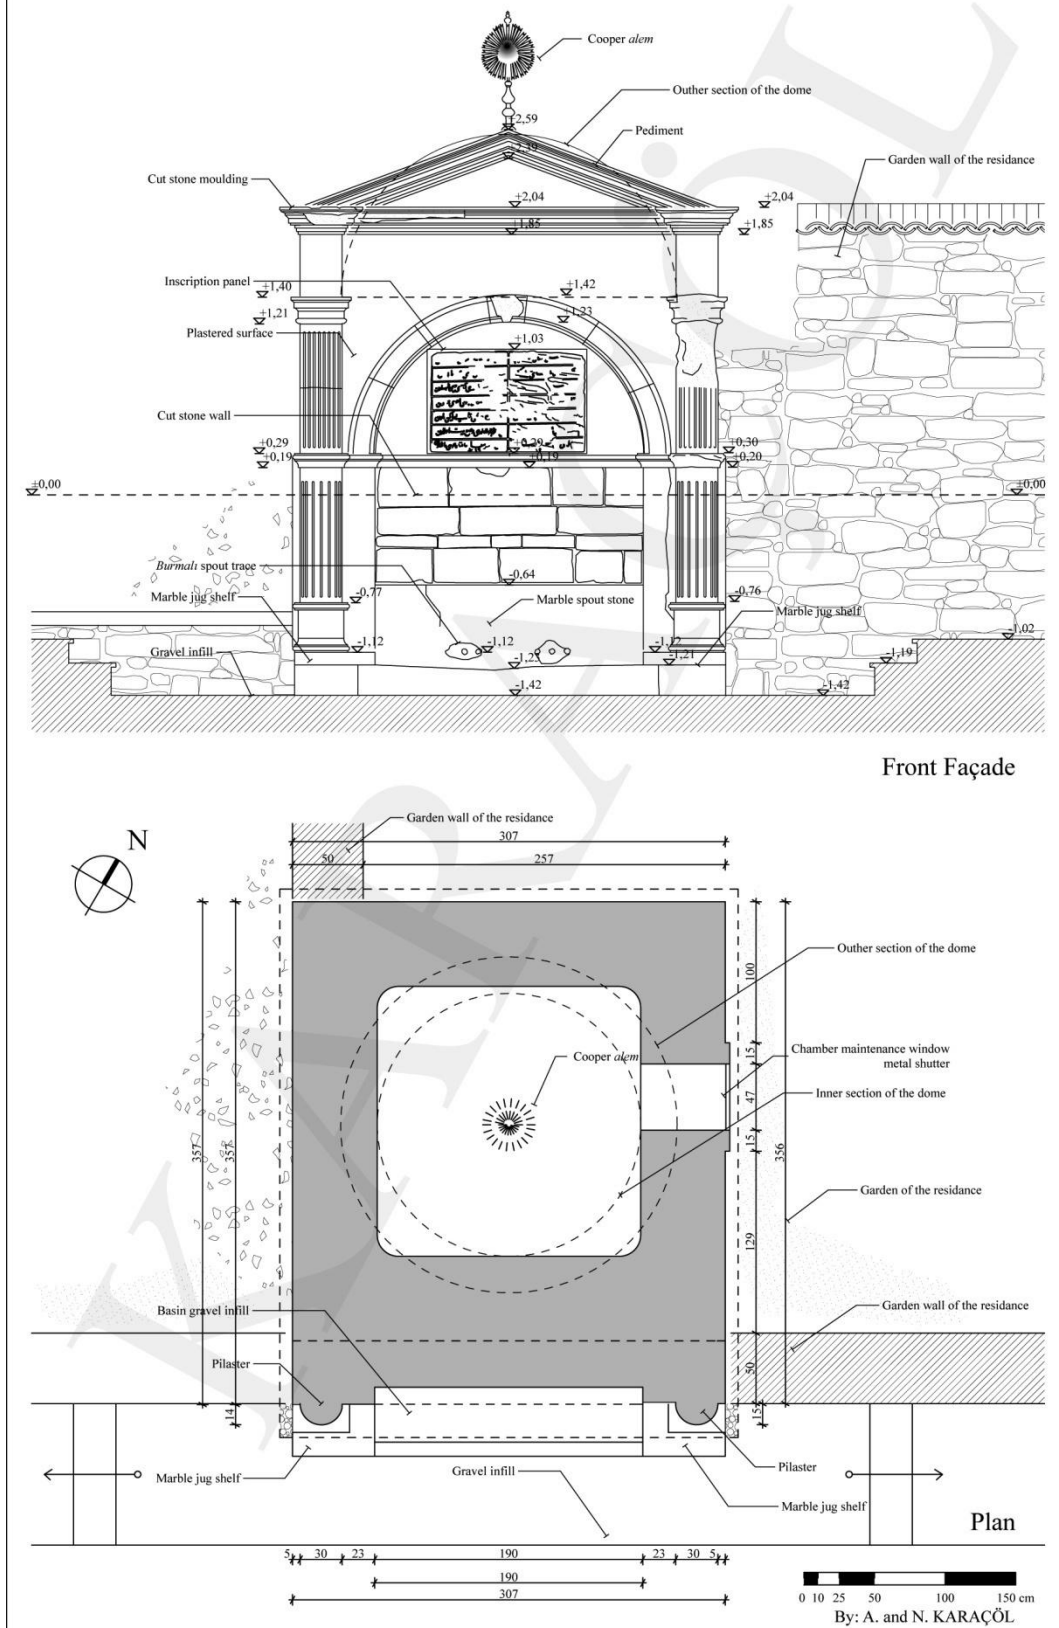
Tosun Paşa Fountain front façade and plan drawings
